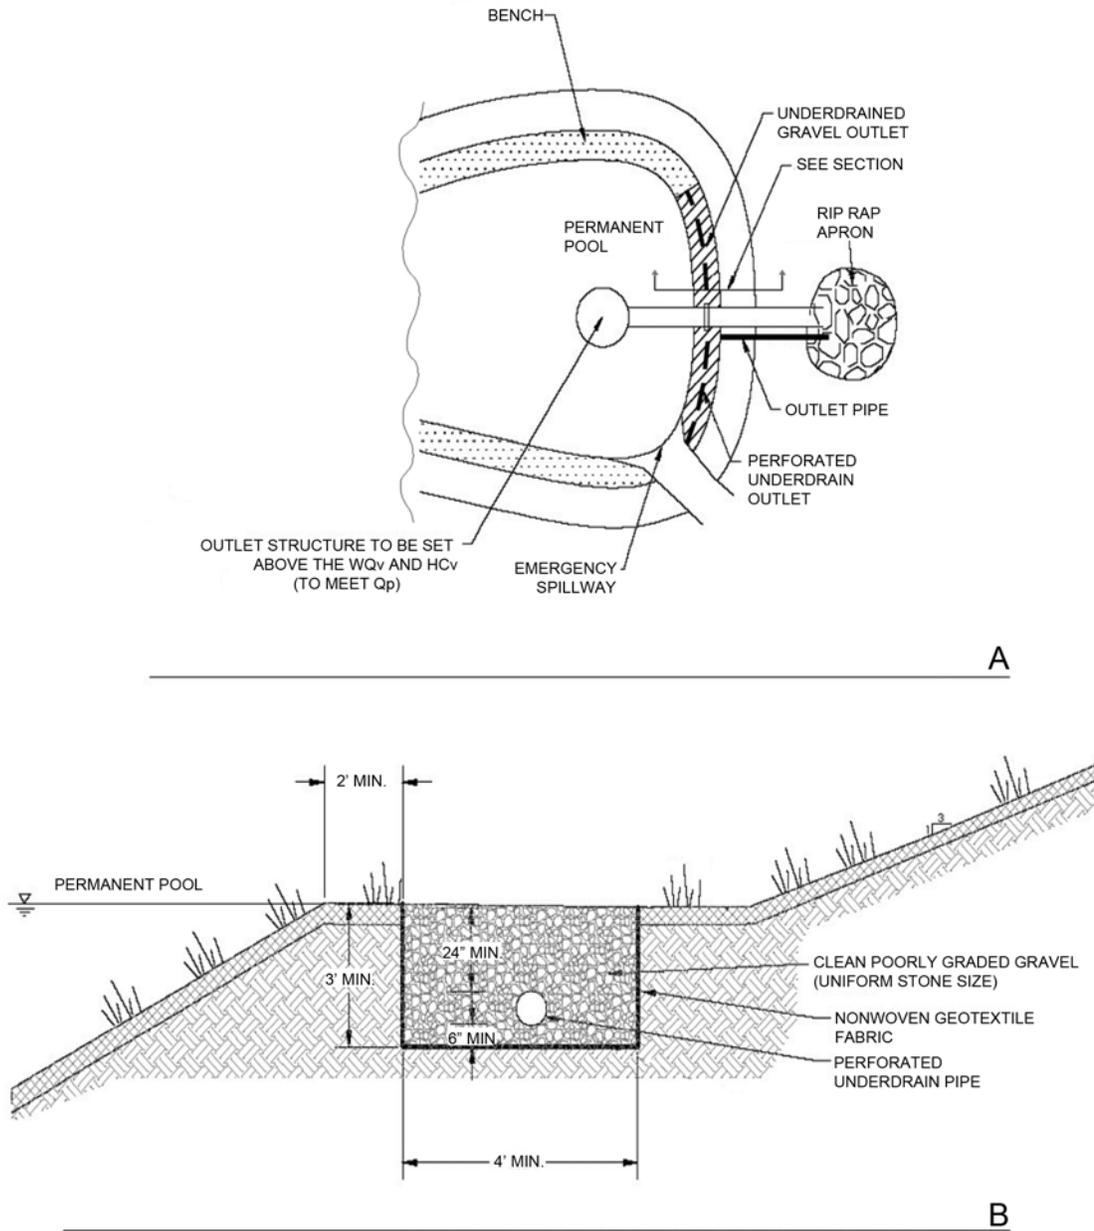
(A) Generalized plan view of underdrained gravel trench outlet for a shallow treatment wetland or basin and (B) Profile of underdrained gravel trench (adapted from Maine DEP 2006 and RI DEM 2010)
